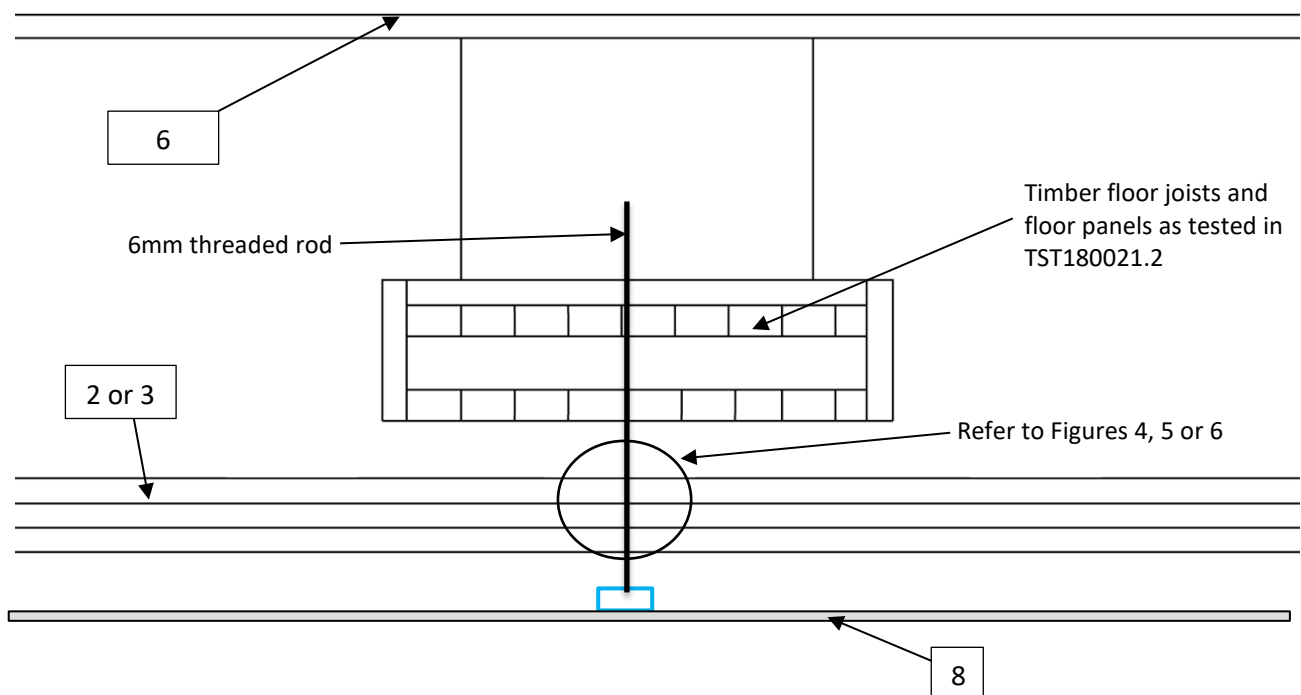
Floor-ceiling system with a false ceiling beneath supported by the timber floor joists and floor panels. Ceiling suspension systems not shown, refer to Figure 1 for Floor-ceiling system detail
